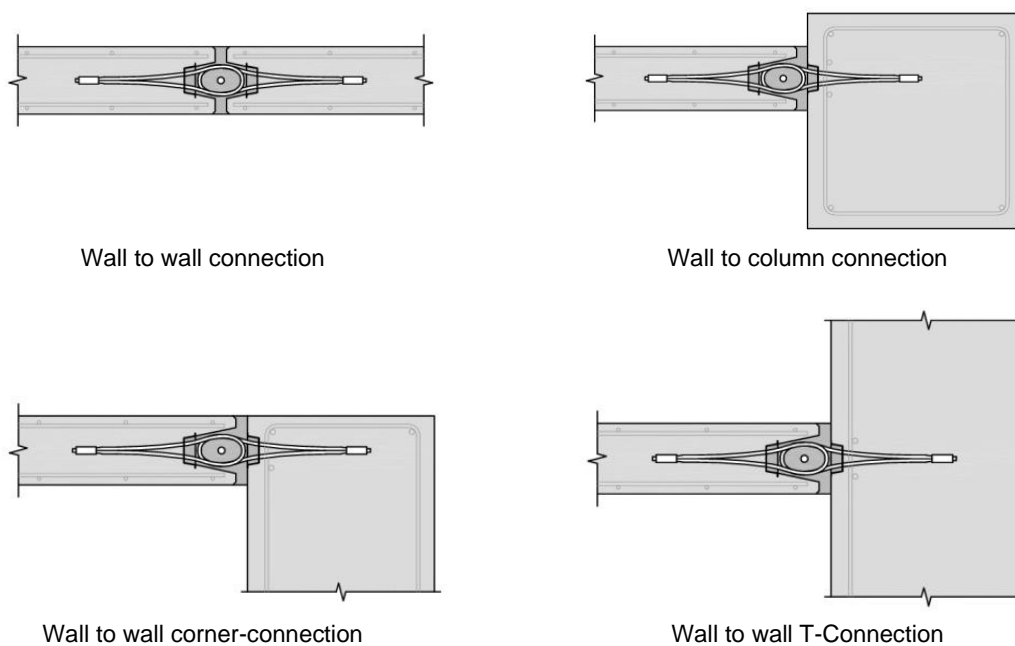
Example of a wire loop system embedded in two concrete members at different times (connections with in-situ concrete elements)
